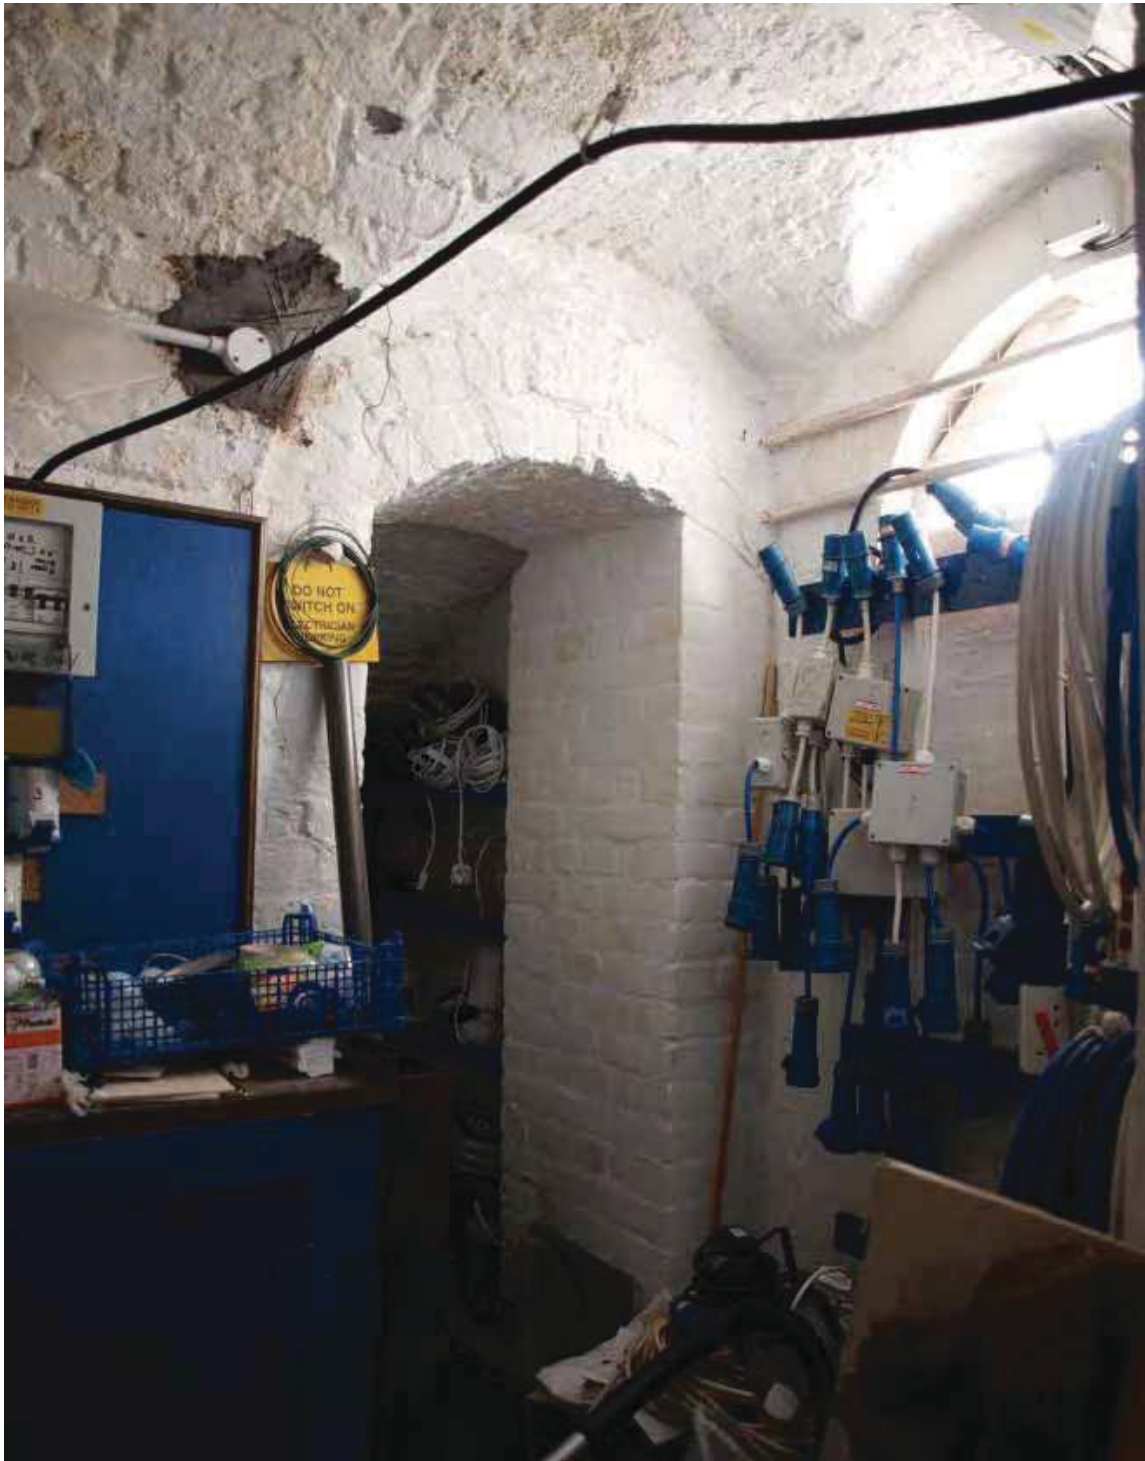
West side of Store room G45, new cold room plant to be installed and timber louvre to replace window in blocked archway
